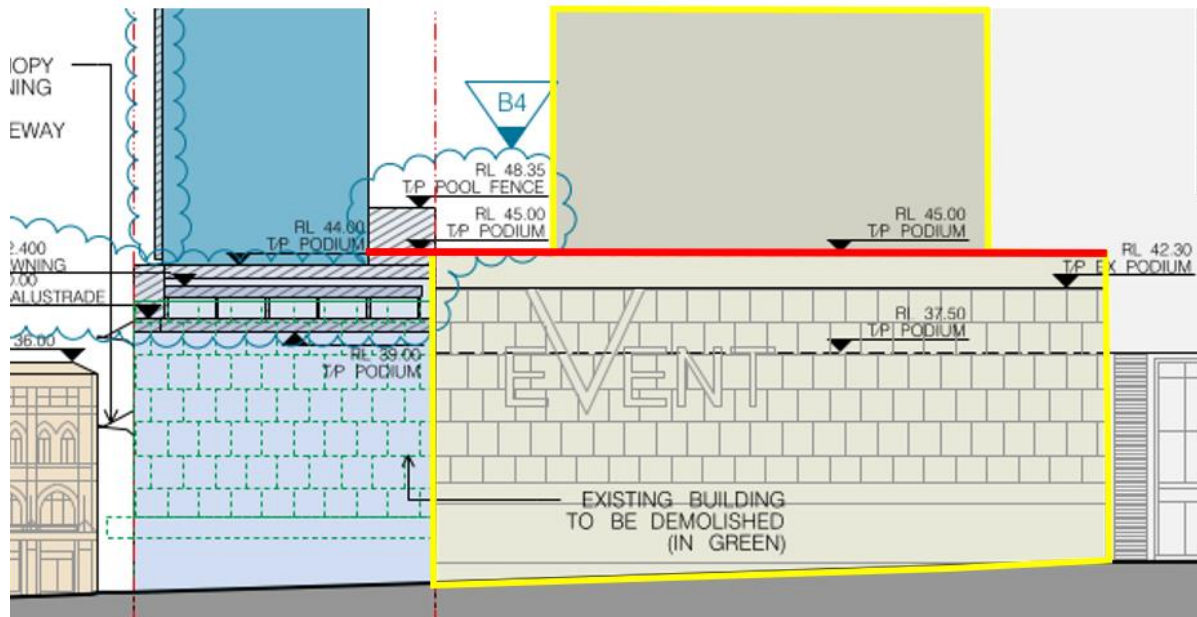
Proposed George Street elevation - yellow outline identifying approved envelope at 505-523 George Street, with red line denoting approved podium height (RL 45.00) which is consistent with the proposed height of the podium adjacent to 505-523
